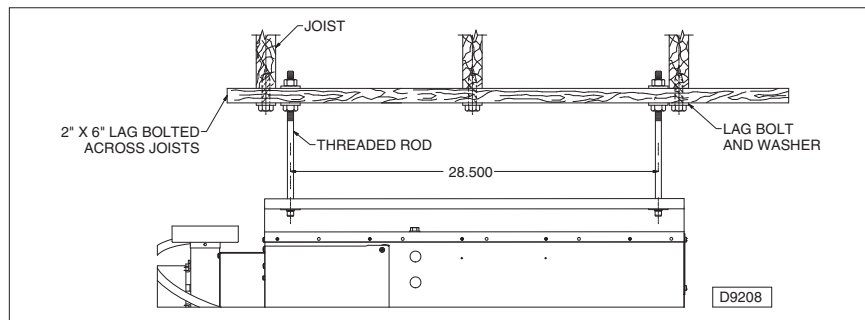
WOOD CONSTRUCTION JOISTS
